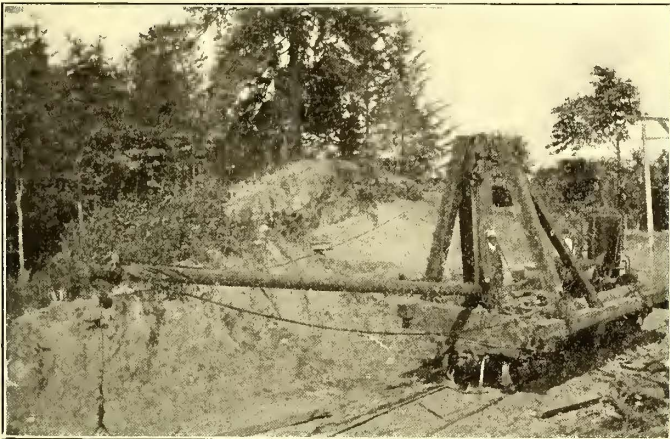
DERRICK CAR USED IN PLACING POLES AND FOR BRIDGE WORK
